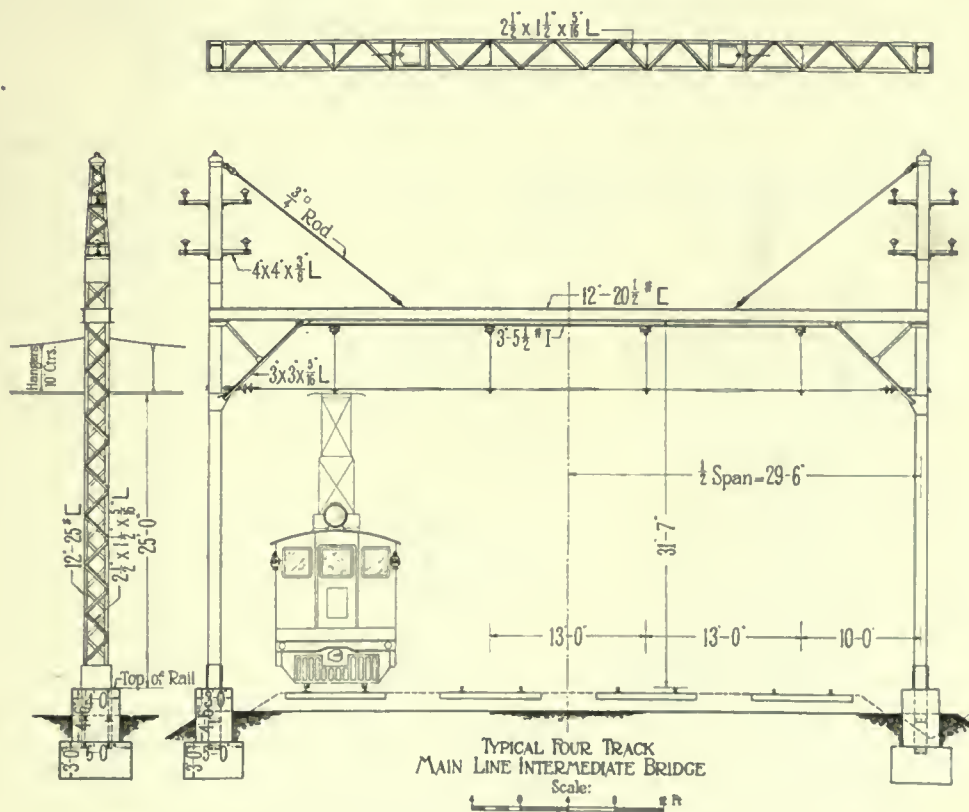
TYPICAL FOUR TRACK STRUT BRIDGE WITH STRAIGHT POSTS
